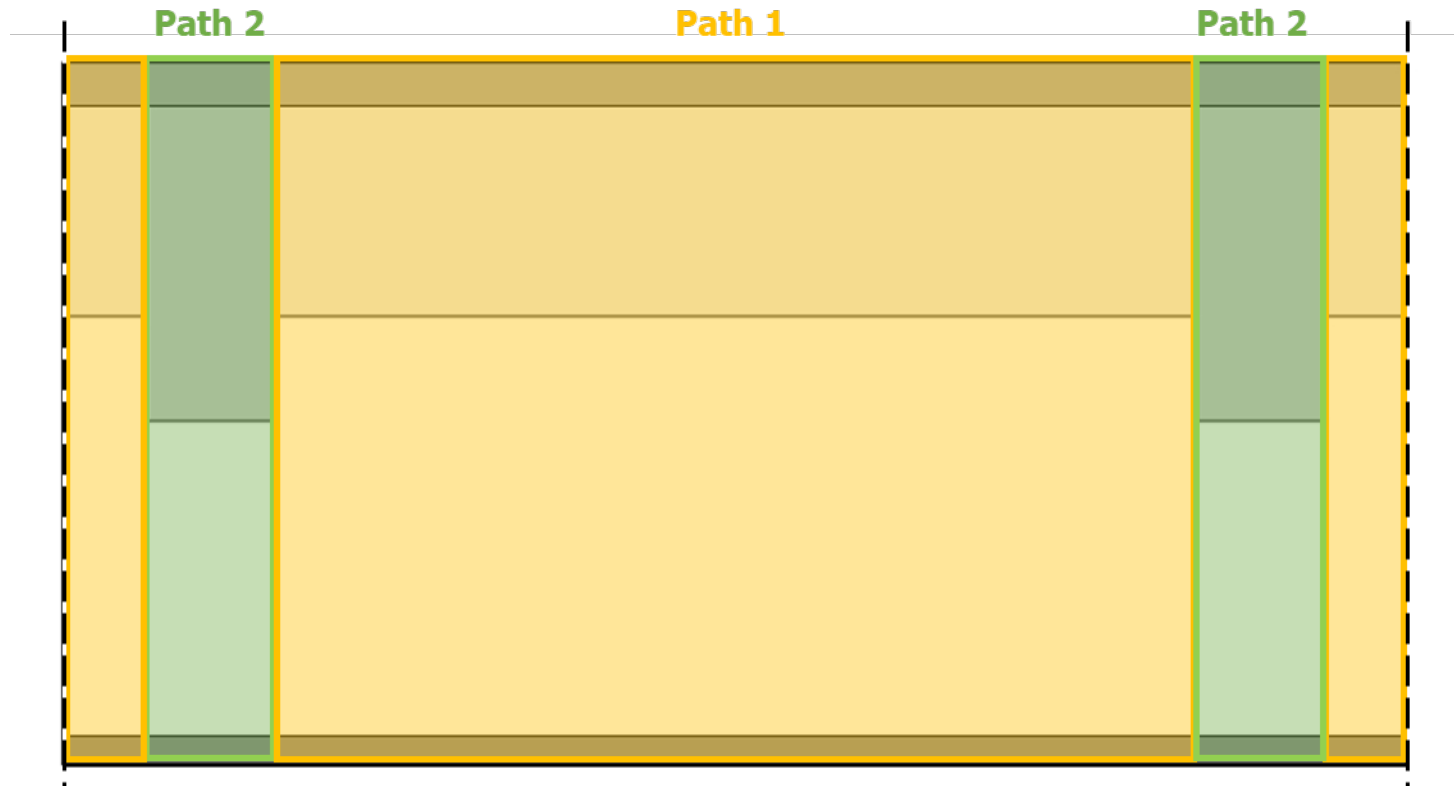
Section/elevation view (same view as Figure 13-13) of the ceiling heat-flow paths
